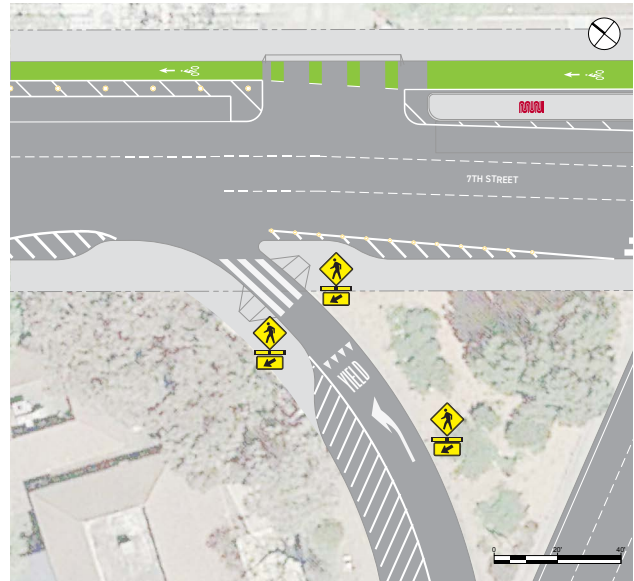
7th Street between Bryant and Harrison streets Improvement Plan
